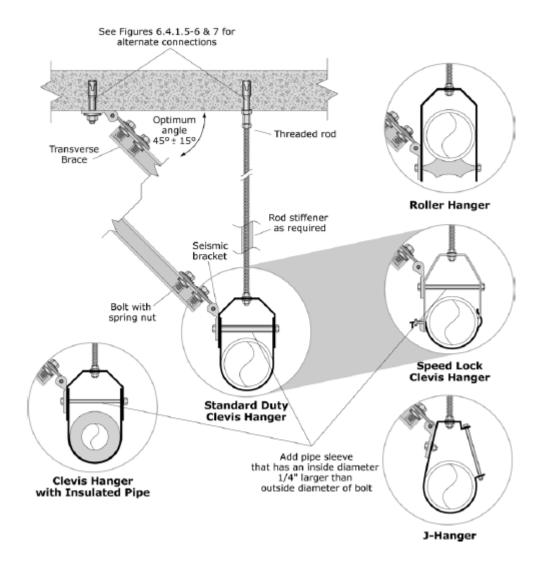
Rigid Bracing – Single Pipe Transverse. (FEMA E-74, 2012, Reducing the Risks of Nonstructural Earthquake Damage)
